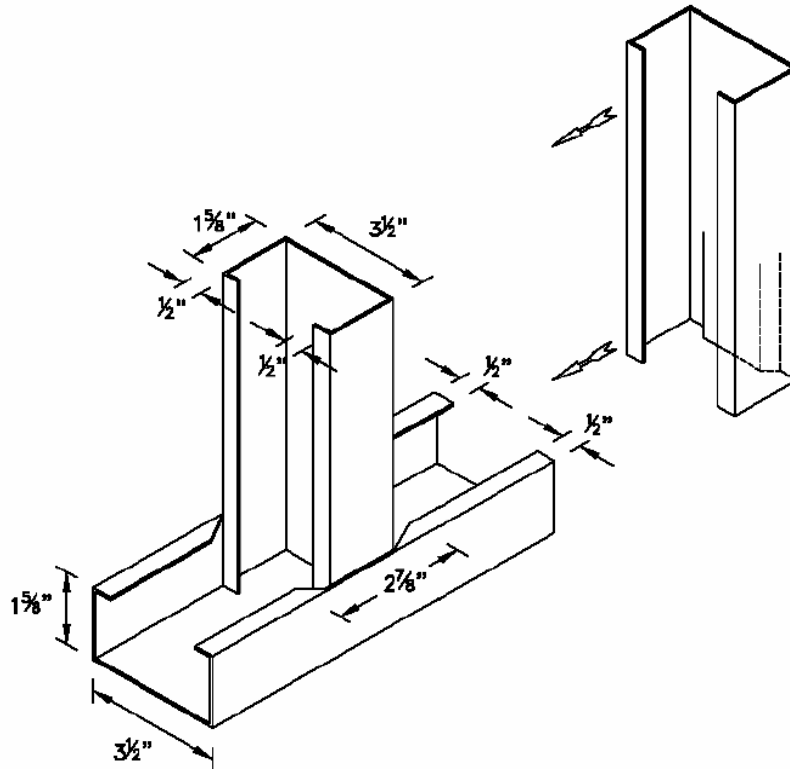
TYPICAL STUD & TRACK DETAIL
